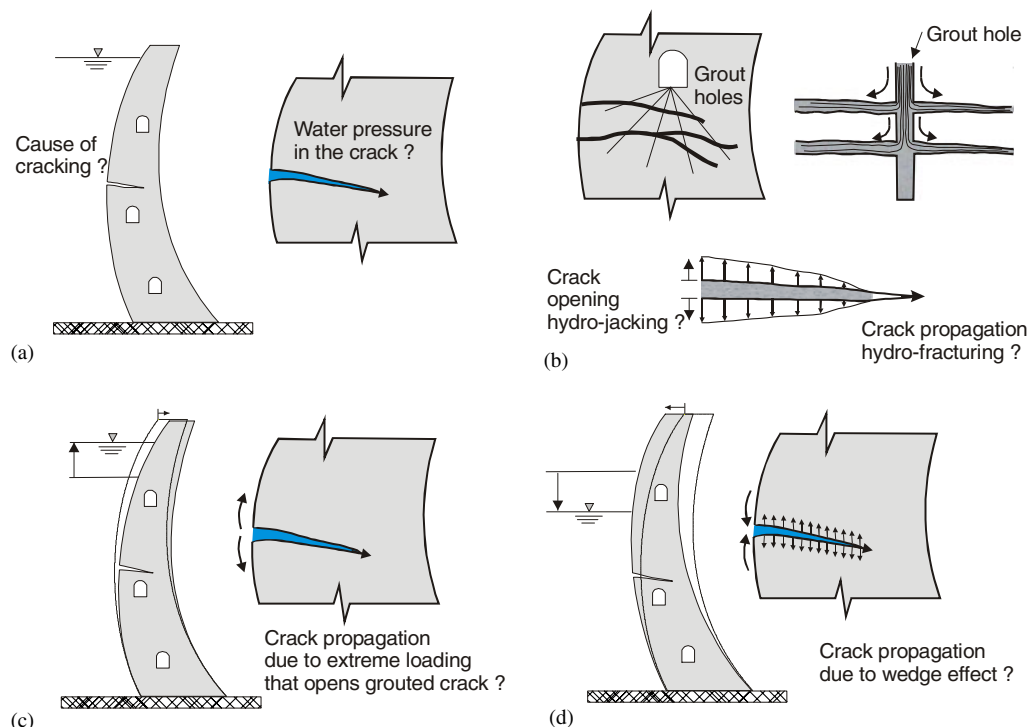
Structural response of dam during and after the grouting process: (a) cracked dam; (b) injecting grout in cracks; (c) crack propagation; (d) wedge effect
